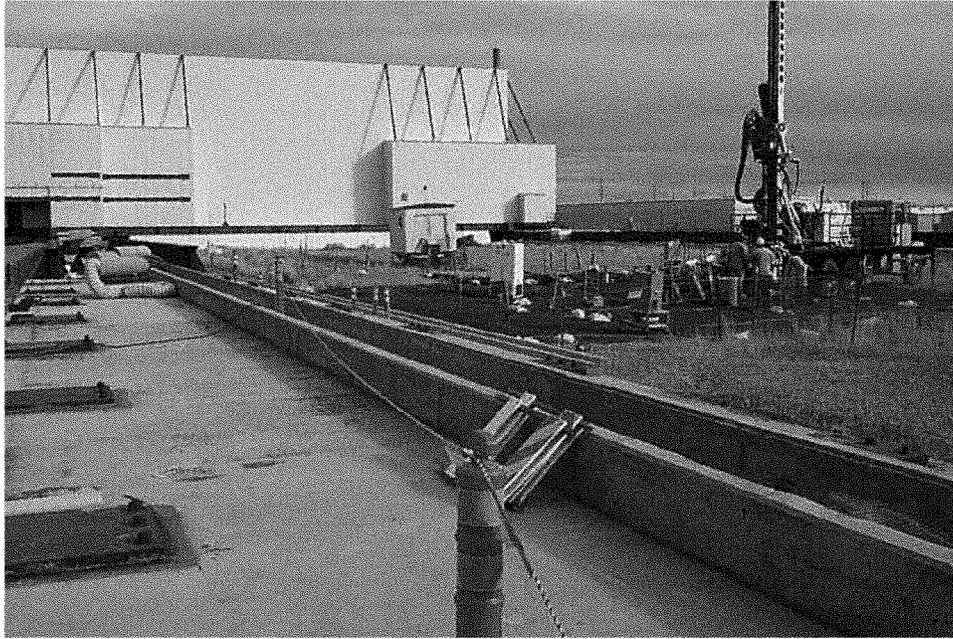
Existing concrete pad and LMAES Retrieval Building on Pit 9.
